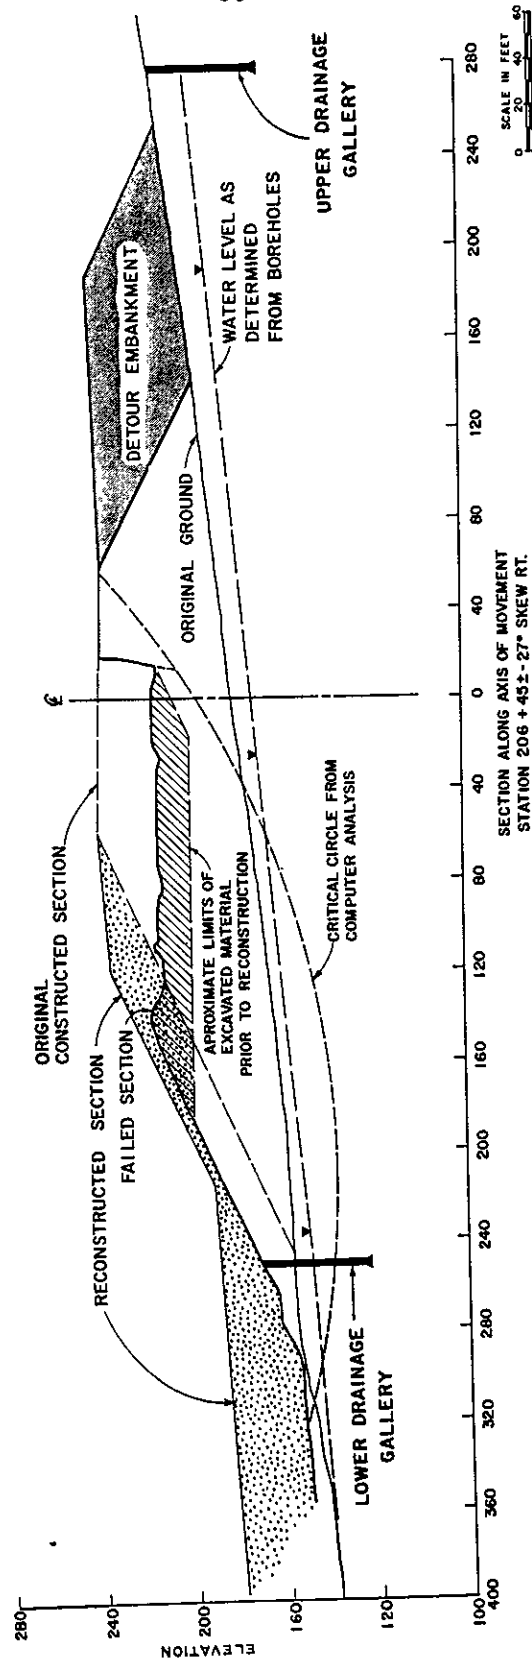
Cross section along axis of movement, Station 206+45 ±, showing failure plane, reconstruction features and detour embankment
